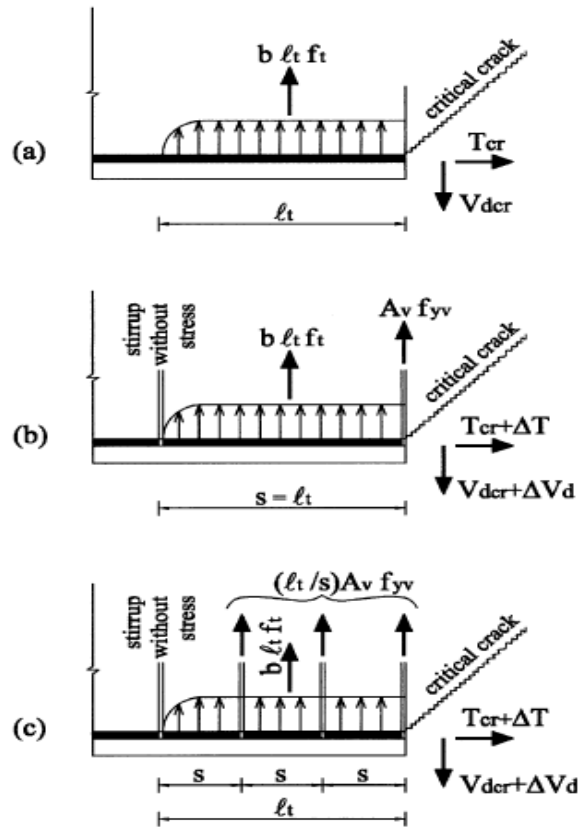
Forces acting in the region of horizontal splitting along the longitudinal reinforcement of beam (a) without stirrups, (b) with stirrups at spacing, $s = l_t$ and (c) with $s <$
